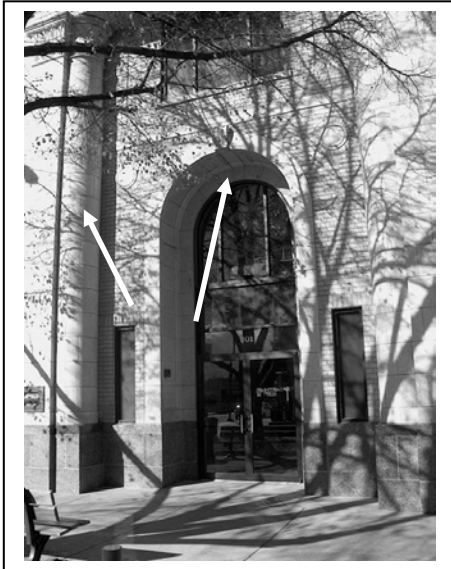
Arched entryway. Tapered terra-cotta clad pilasters.
